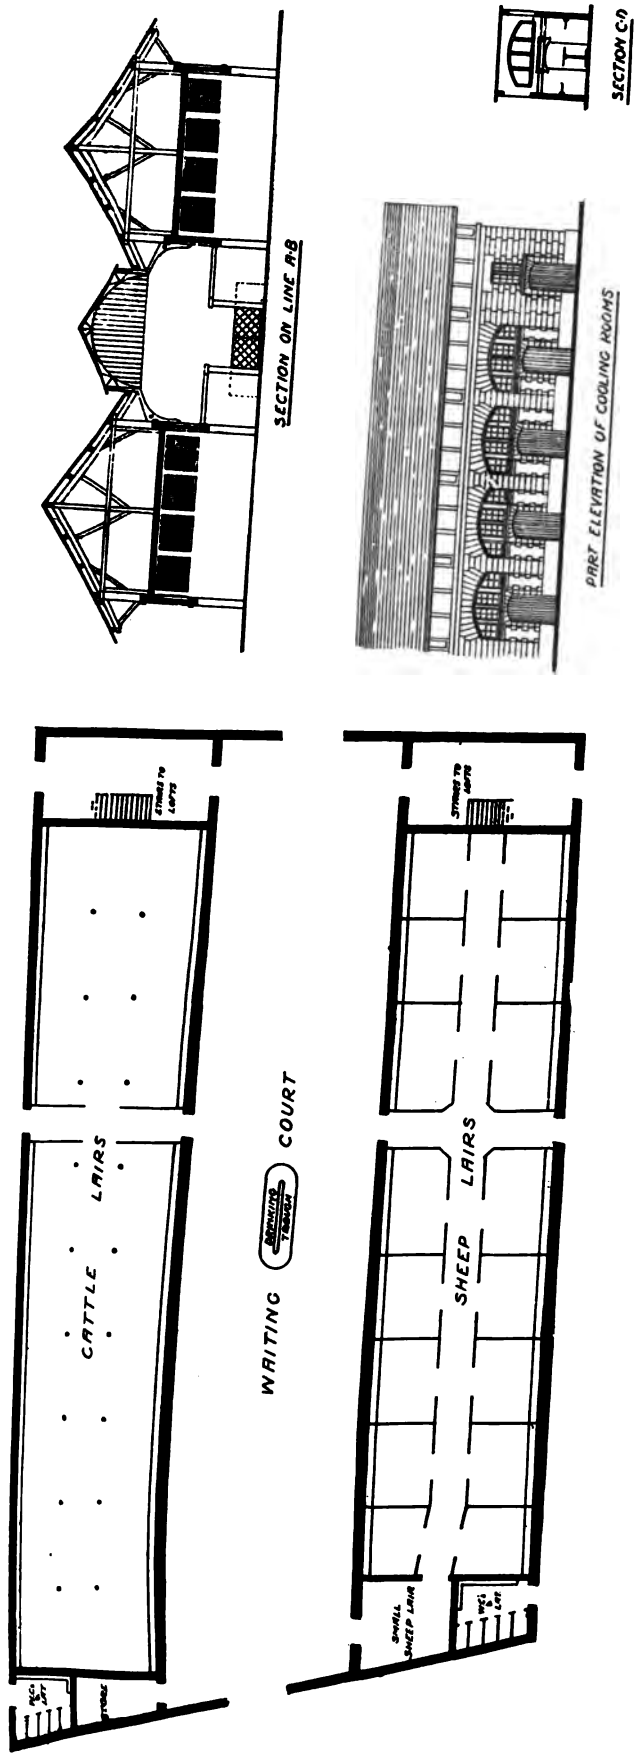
LA VILLETTE. PARIS. PLAN, ELEVATION & SECTION OF SLAUGHTER COURT & COOLING ROOMS & PLAN OF LAIRS & WAITING COURT.
